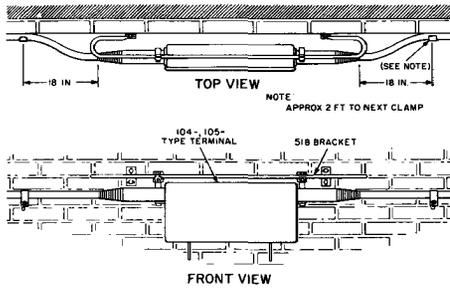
Typical Bracket and 104- or 105-Type Terminal Mounting
